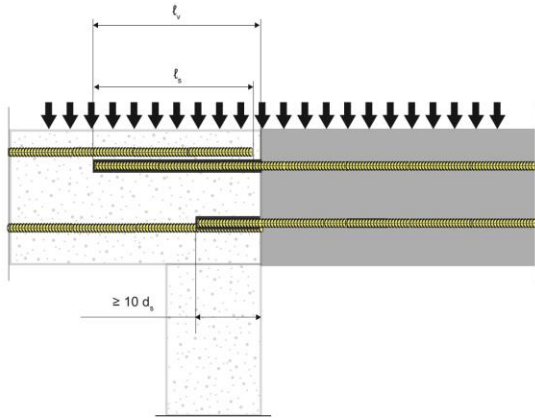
Overlapping joint at a foundation of a wall or column where the rebars are stressed in tension
